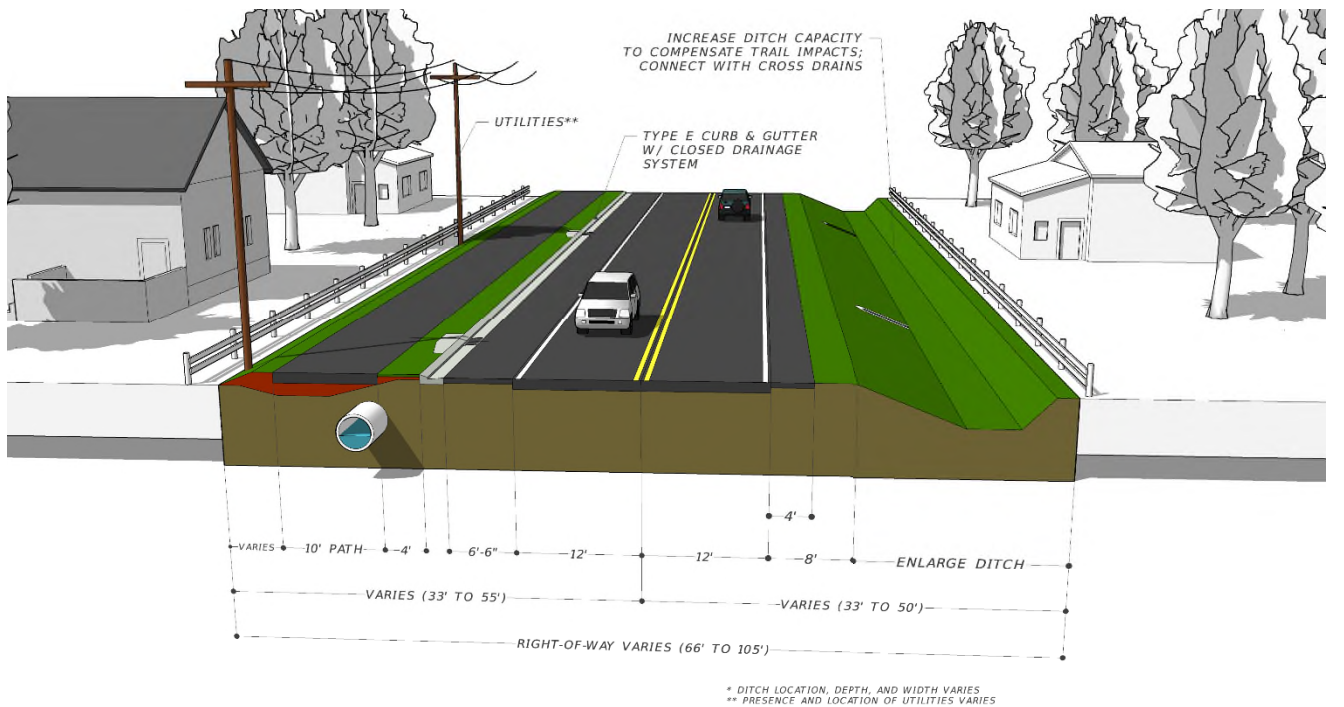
| Typical Section 4B – Very Constrained with Curb and Gutter
